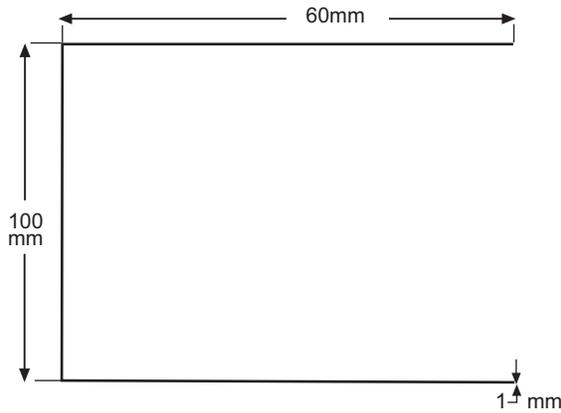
Cross section showing the dimensions of designed cold-form C section beam.
